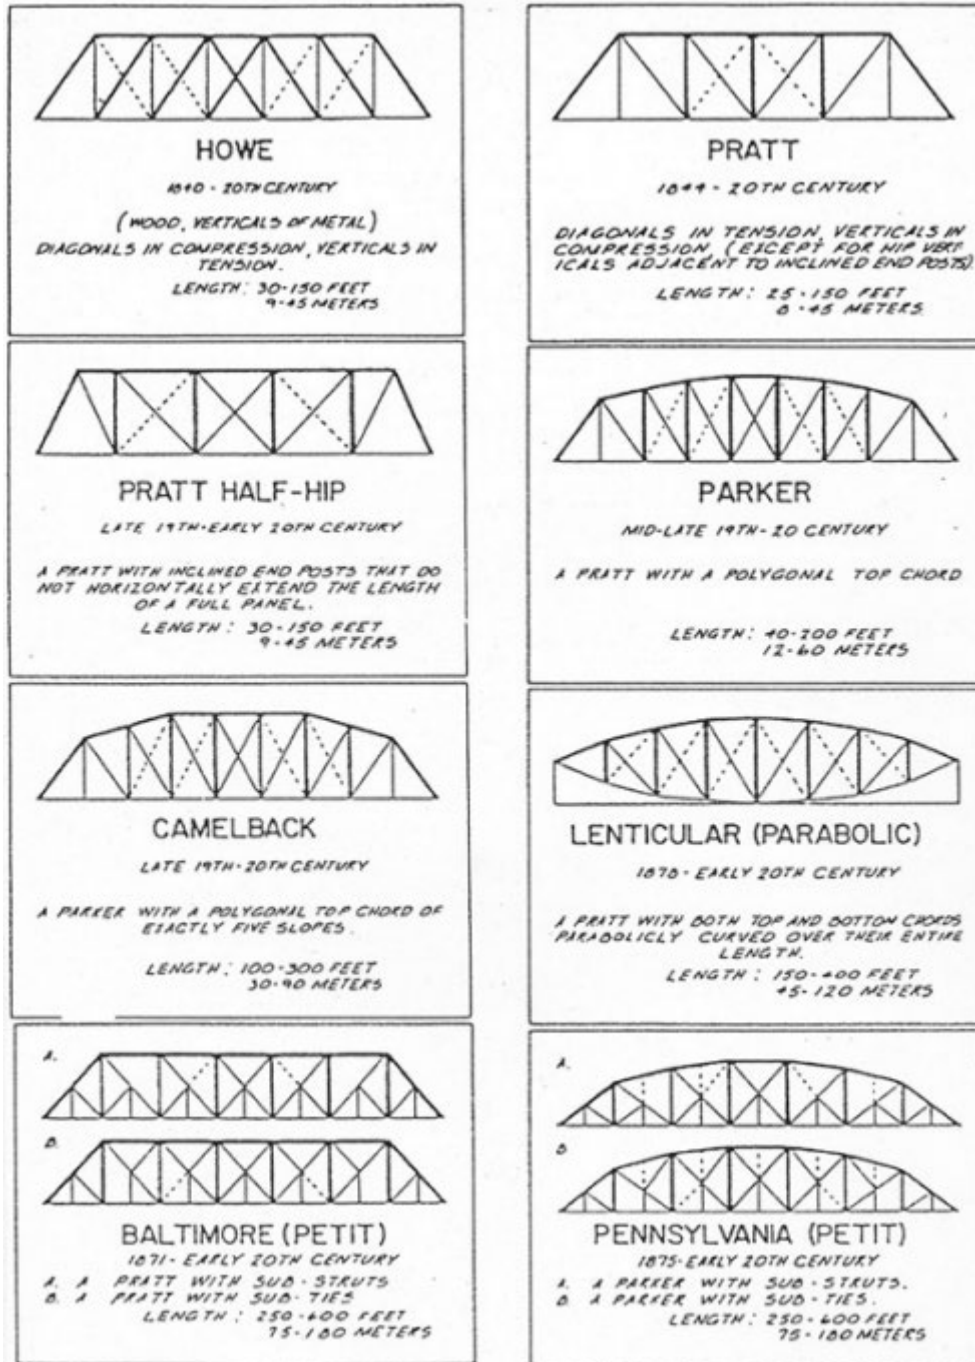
Metal Truss Bridge Types Part 1 (Allen and Jackson 1975)
